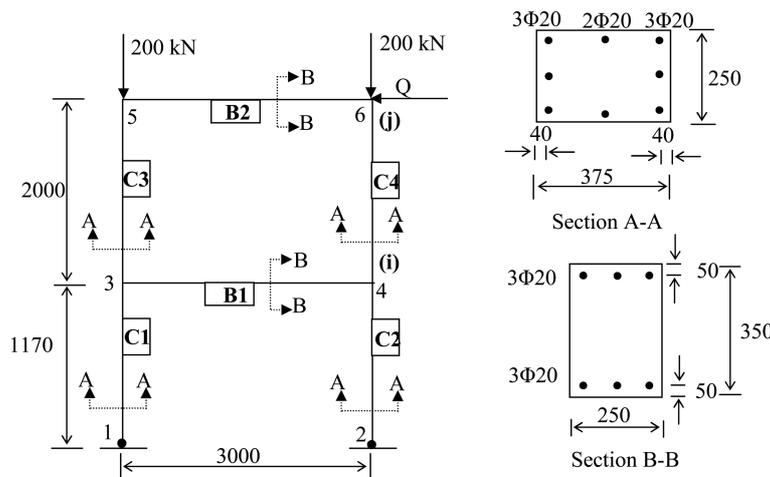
Two story reinforced concrete frame model tested by Chan *et al.* (2000) (dimensions in mm)
